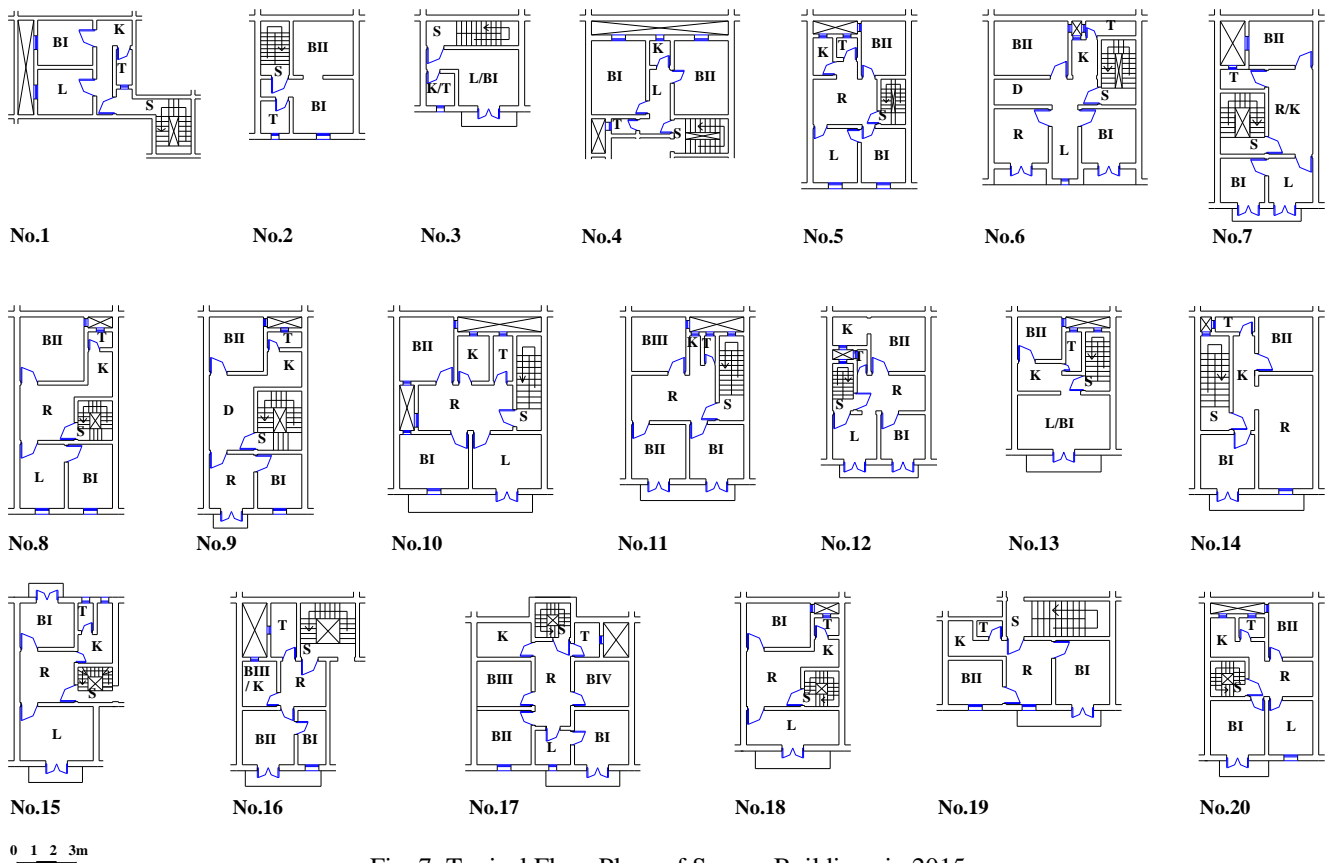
Typical Floor Plans of Survey Buildings in 2015
